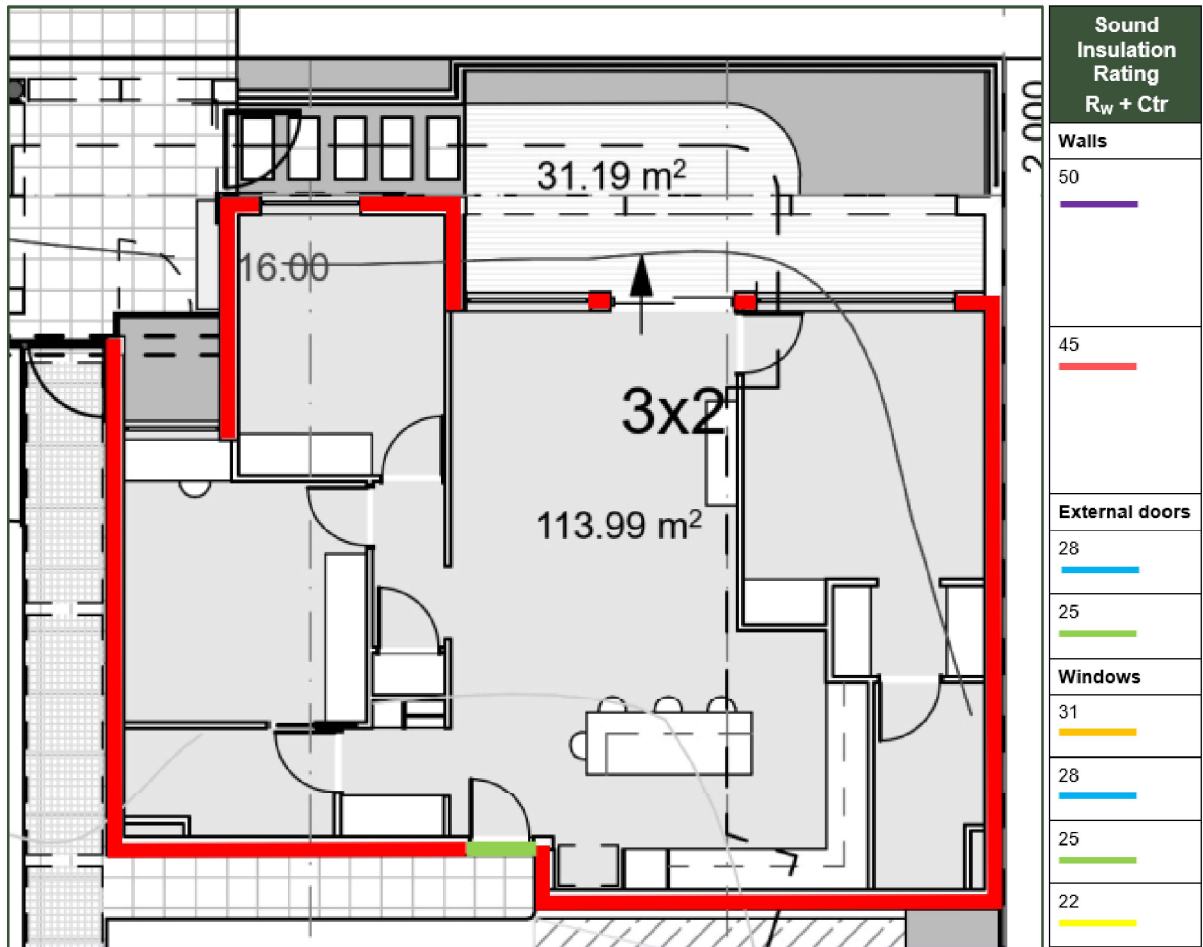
Building elements acoustic markup - Level 1 to 2, north side. Quiet House A.
